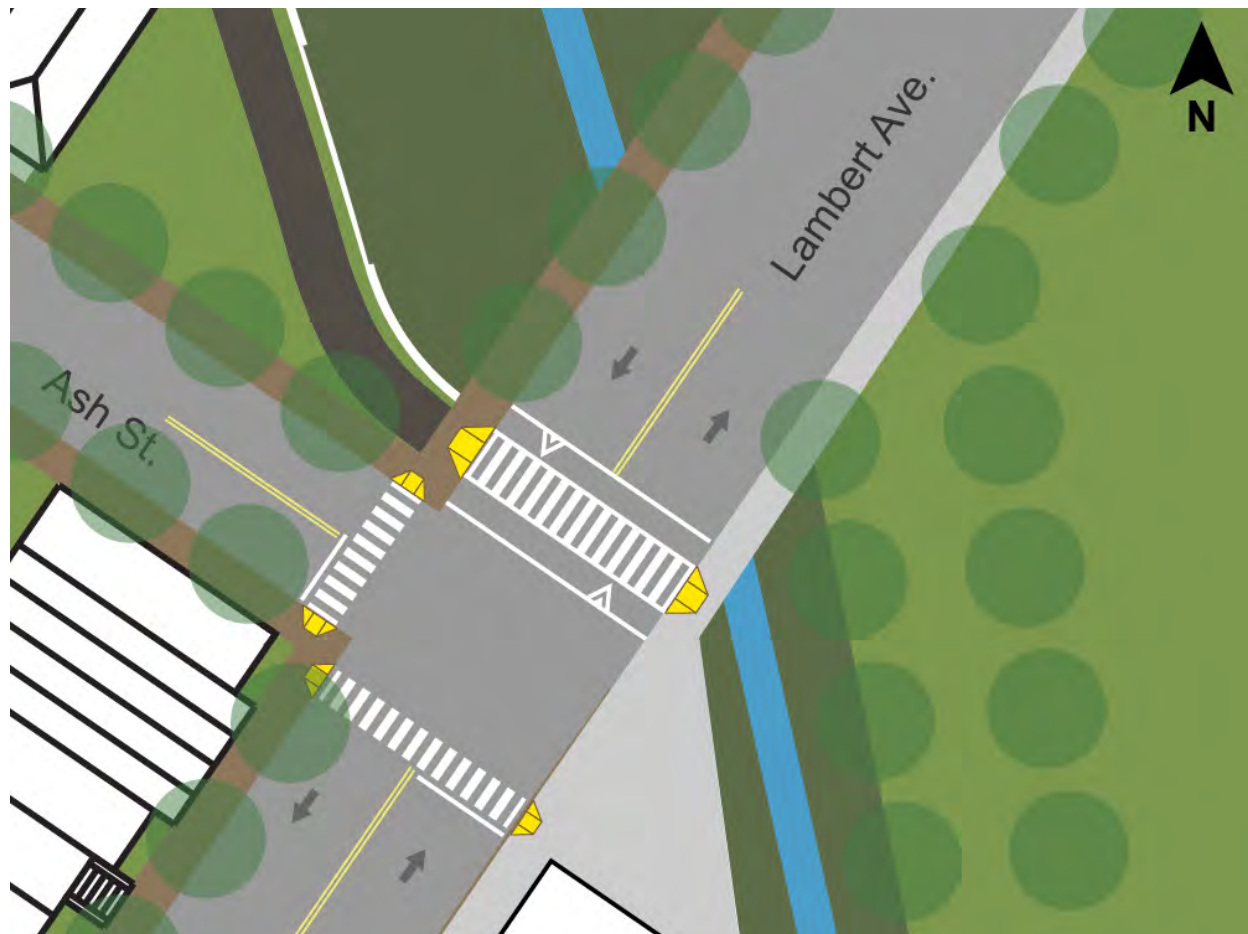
Lambert Avenue and Ash Street Conceptual Intersection Design
